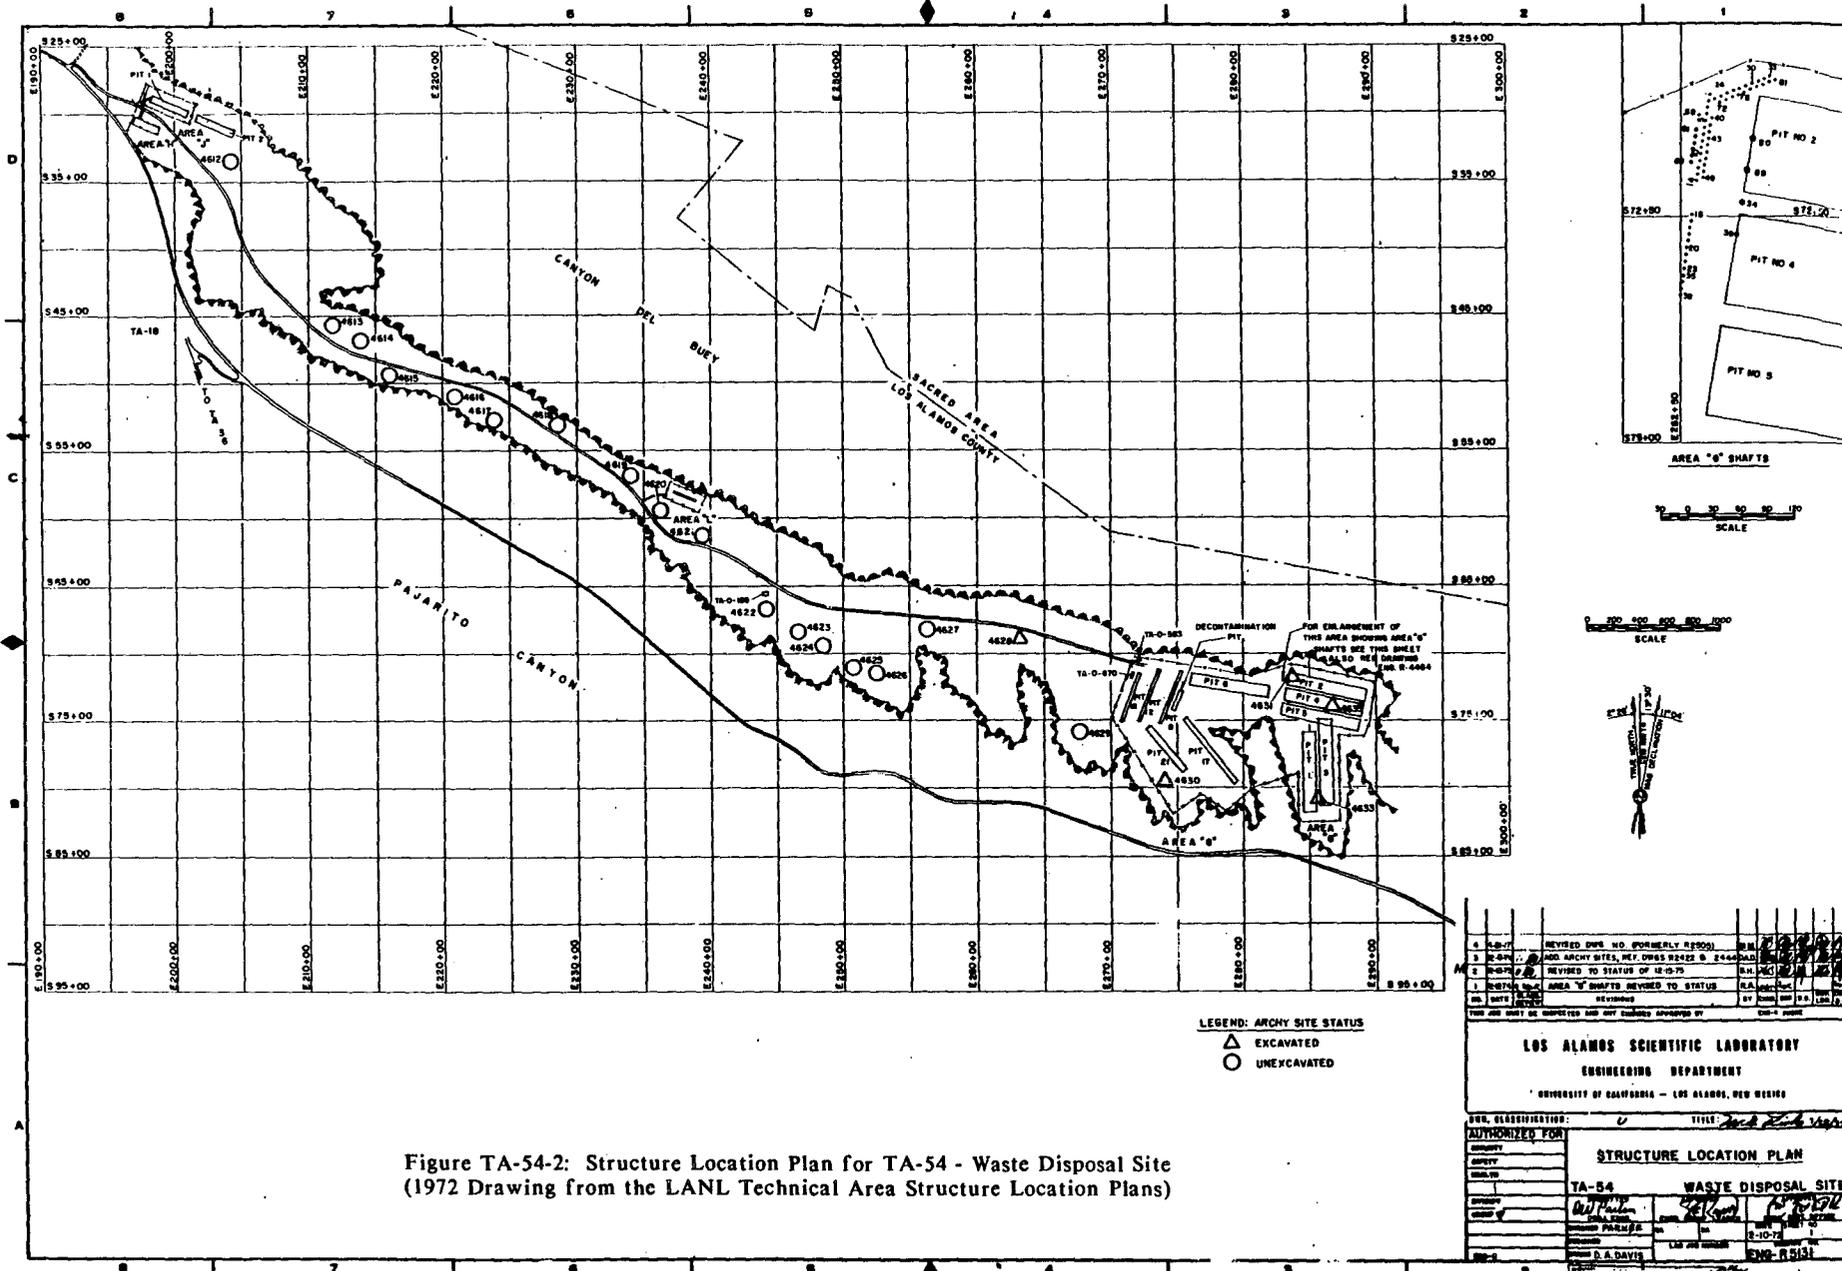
Structure Location Plan for TA-54 - Waste Disposal Site (1972 Drawing from the LANL Technical Area Structure Location Plans)
